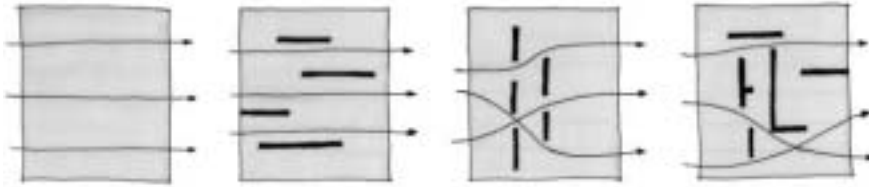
Sketch of various plan-layouts with various degrees of obstruction for the airflow in the cross-ventilation principle. Open plan (*far left*), space-defining walls oriented in parallel with the airflow (*left*), space-defining walls oriented perpendicular to the airflow (*right*), and a combination of the two latter forming more closed and defined spaces, that nevertheless are openly connected to each other (*far right*).
